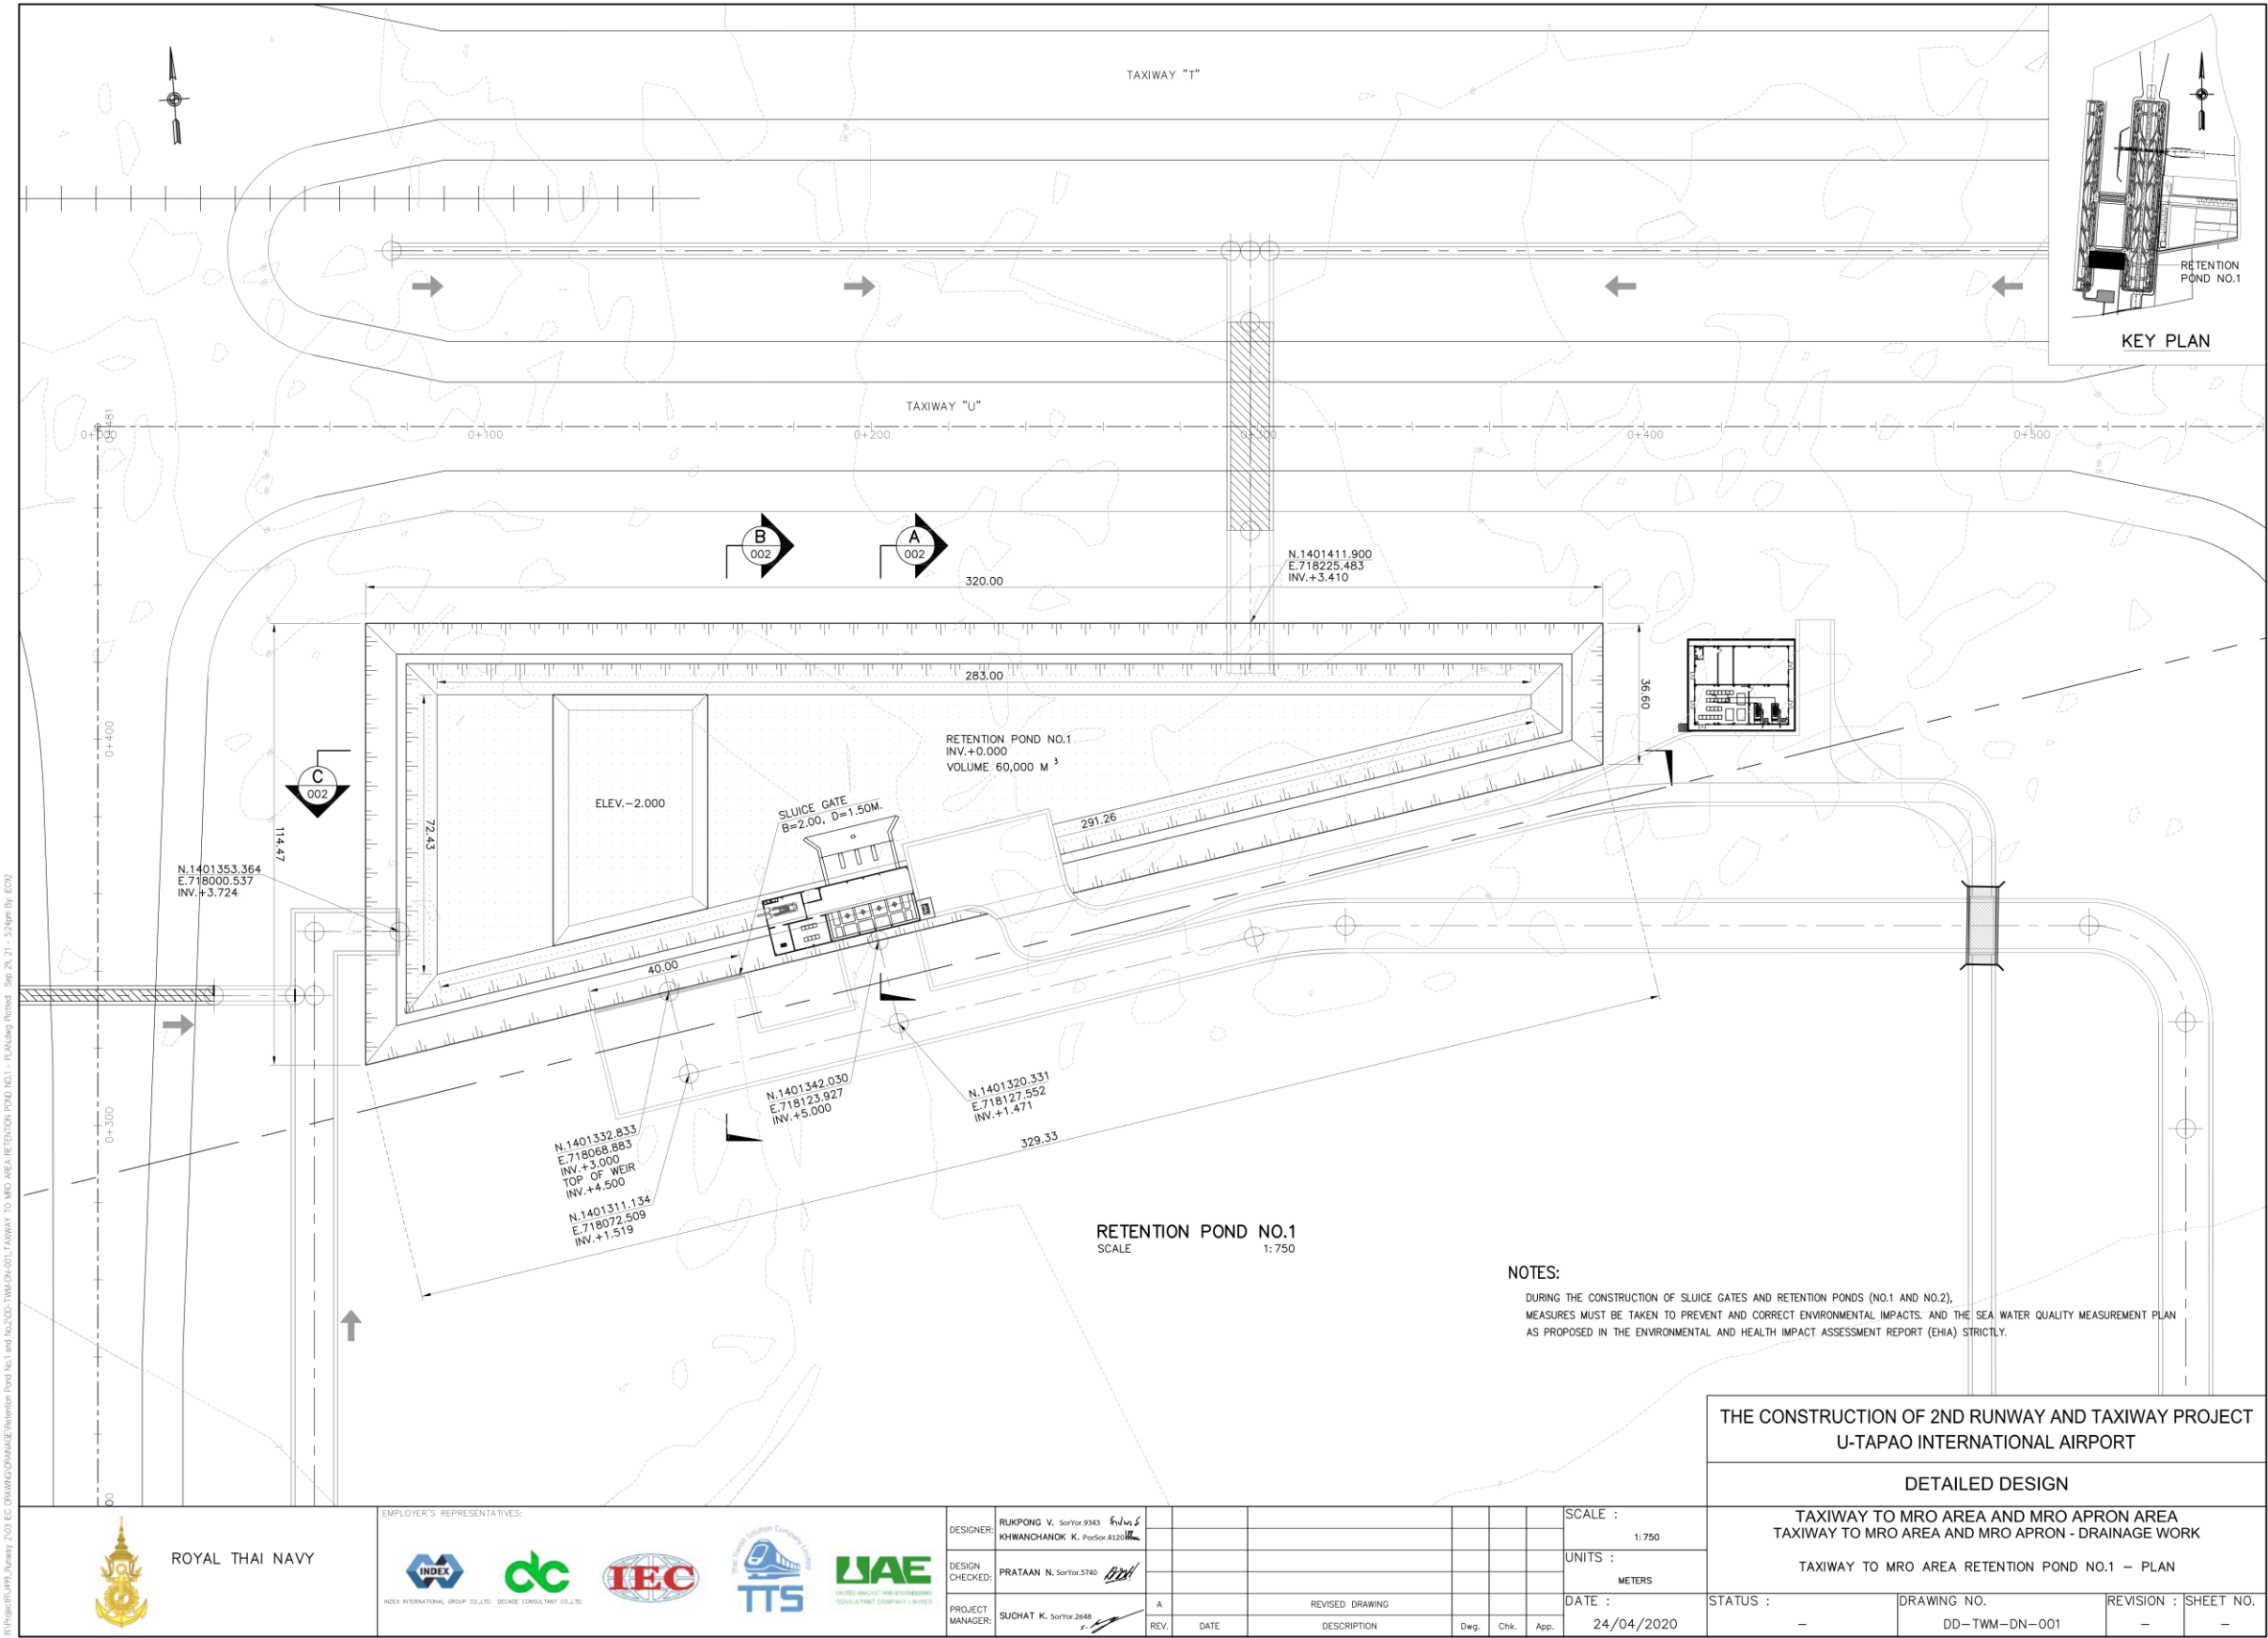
23 Image of a cut-out showing a water drain channel with a bridge in the location of the drain gate and a description of Retention Pond No. 1 appearing in the construction plan
